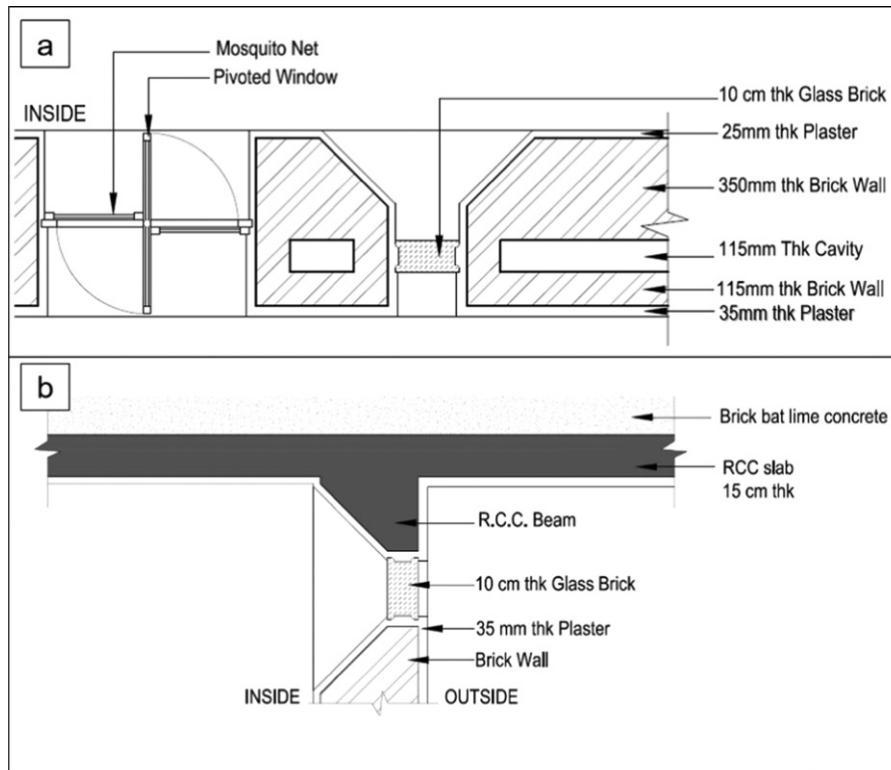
Cross section of: (a) wall. (b) roof in Language Lab.
